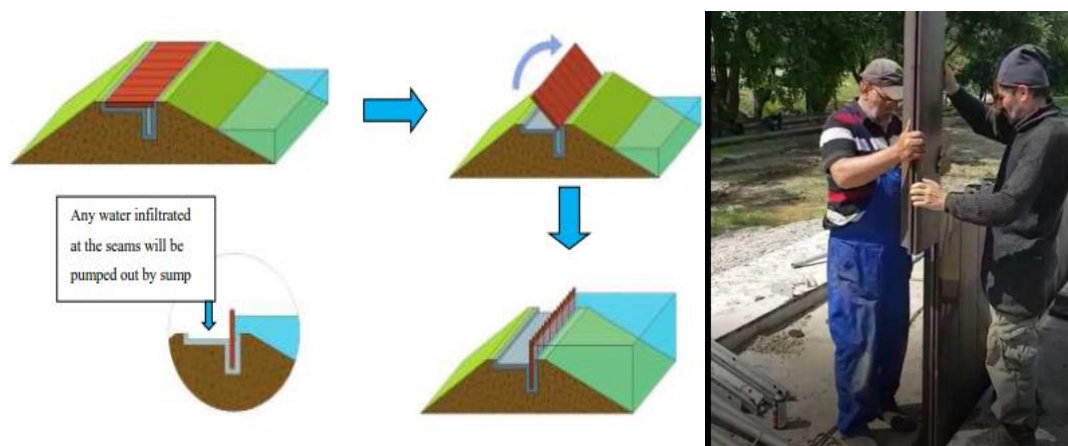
Basic design of Flip-flap cofferdam (left) and installation (right)
